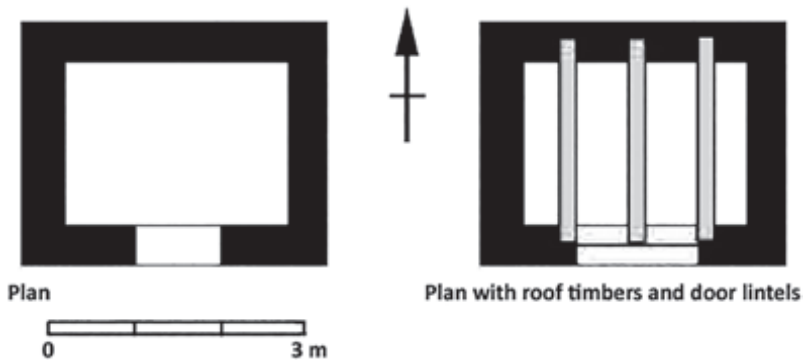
Syracuse House plans used in the econometric calculations. Drawn by author
